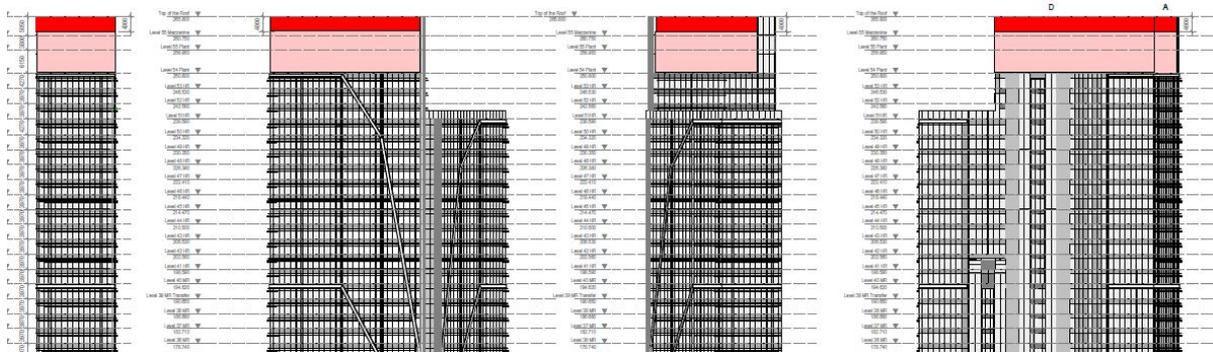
Commercial tower signage locations east (1), north (2), west (3) and south (4) elevations.
